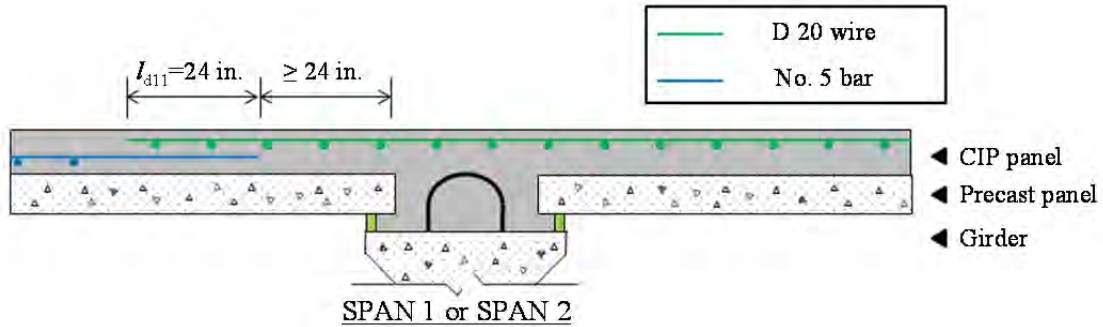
Details of transverse splice, Lampasas River Bridge (Section N-N)
